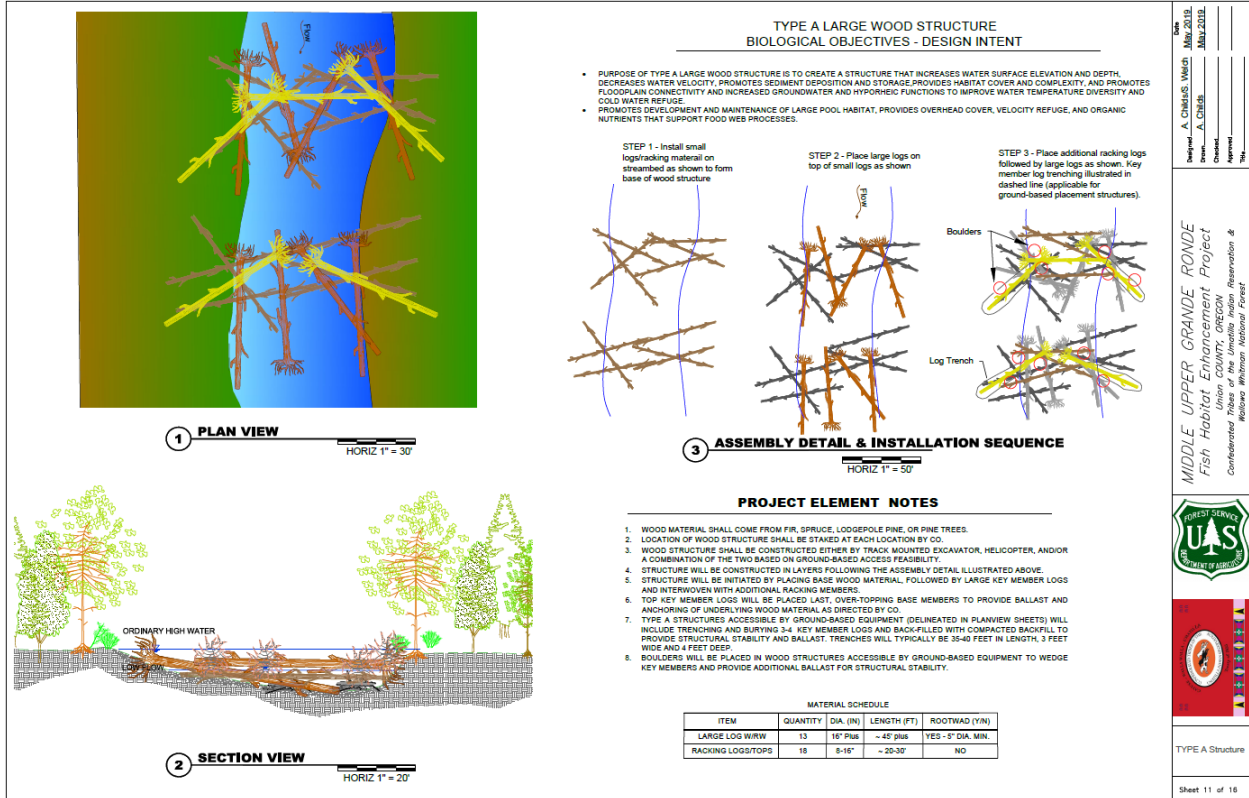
Large Wood Structure Type A Typical Drawing Detail
